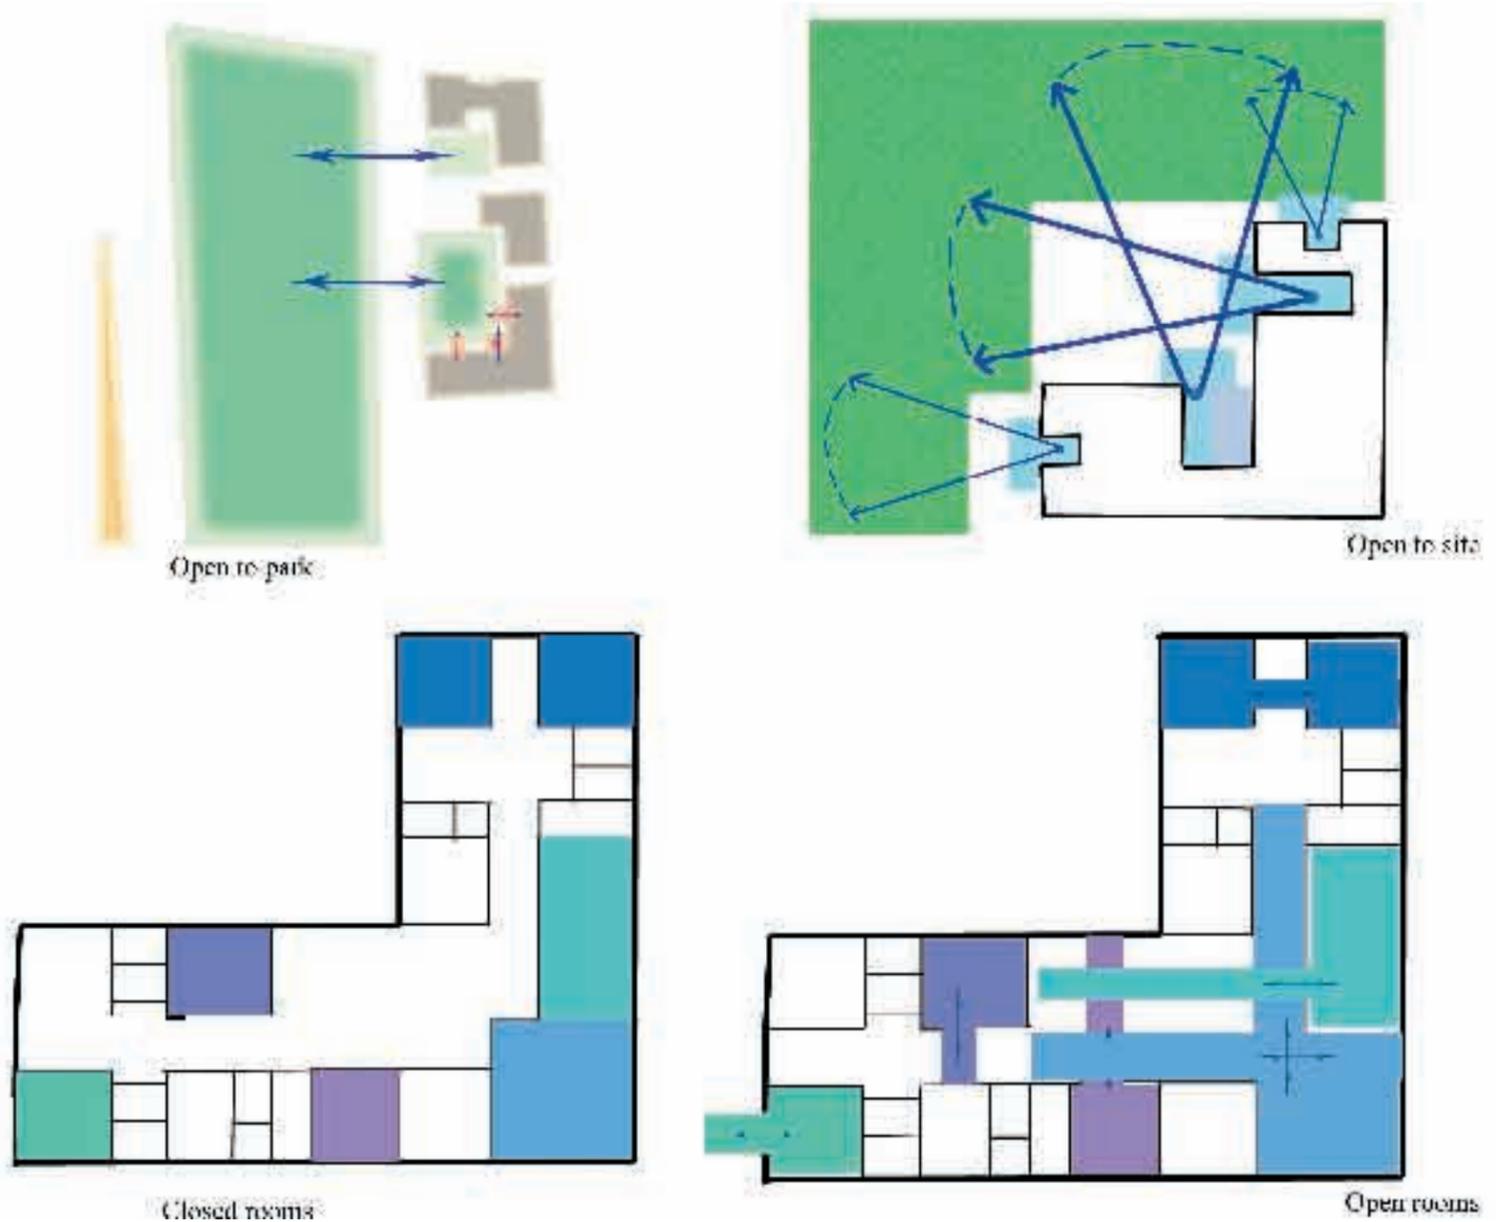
Permeability diagrams. The idea behind a permeable building is that the building can alternately be read as open and closed. Space is extended through the use of sliding doors. This also allows for greater flexibility in the usage of the spaces.
